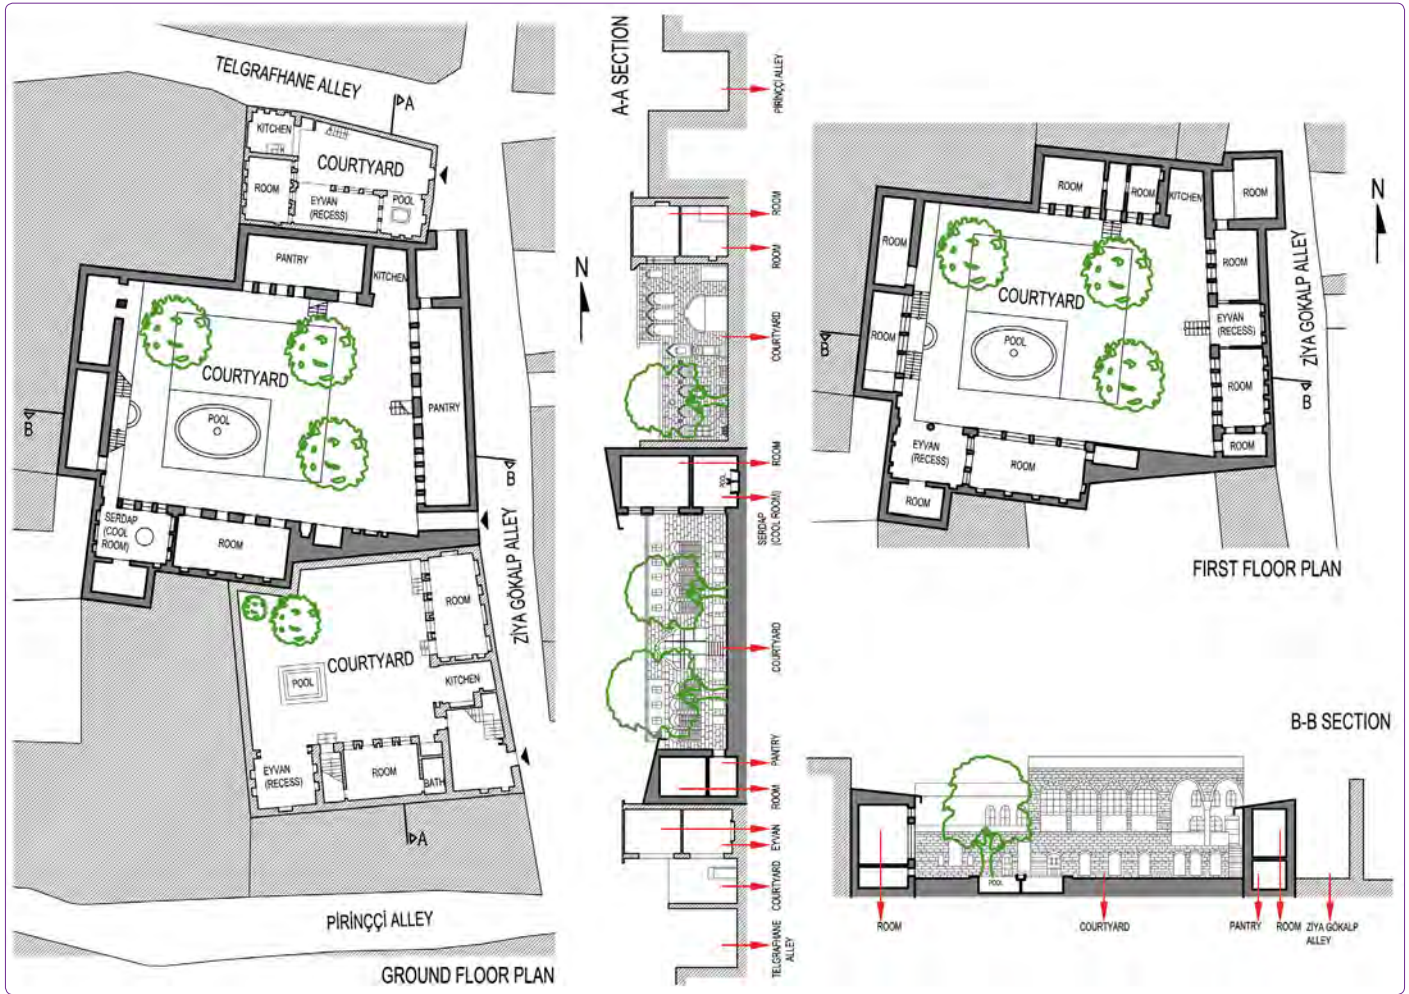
Plans and sections of three neighbour Diyarbakır Houses.
